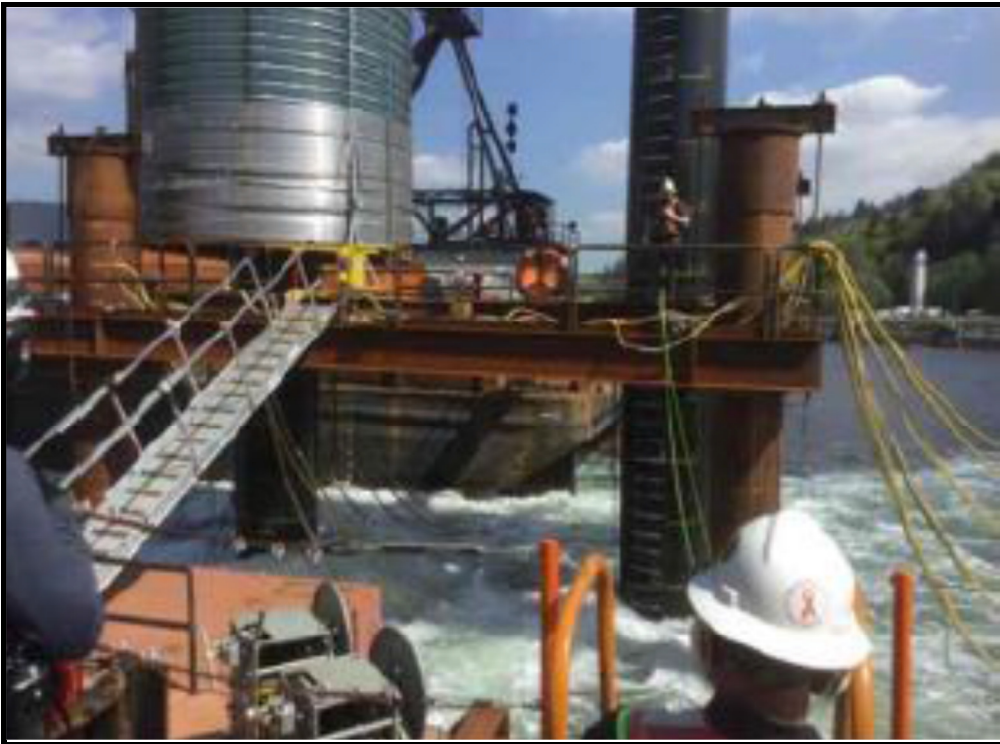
20180502: Active bubble curtain during impact pile installation of Pile I.
